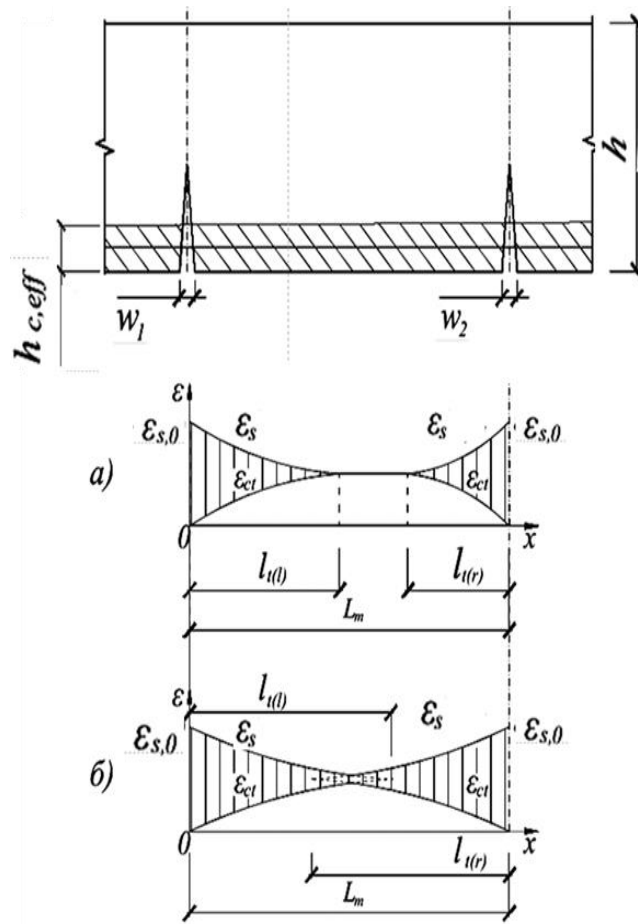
Distribution of relative deformations of concrete and reinforcement along the length of the reinforced concrete block: a - at the first stage of cracking; b - at the second stage of cracking
